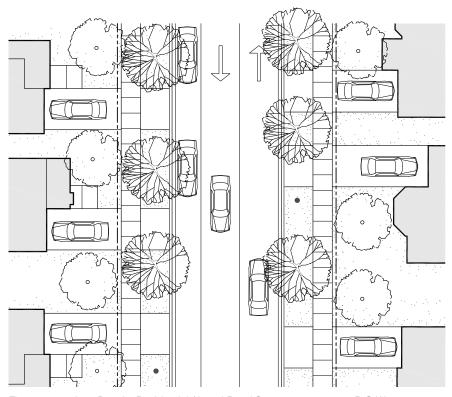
Low Density Residential / Local Road Streetscape - 17.0m R.O.W. / 2 travel lanes / on-street parking on one side / 4.05m boulevard.
